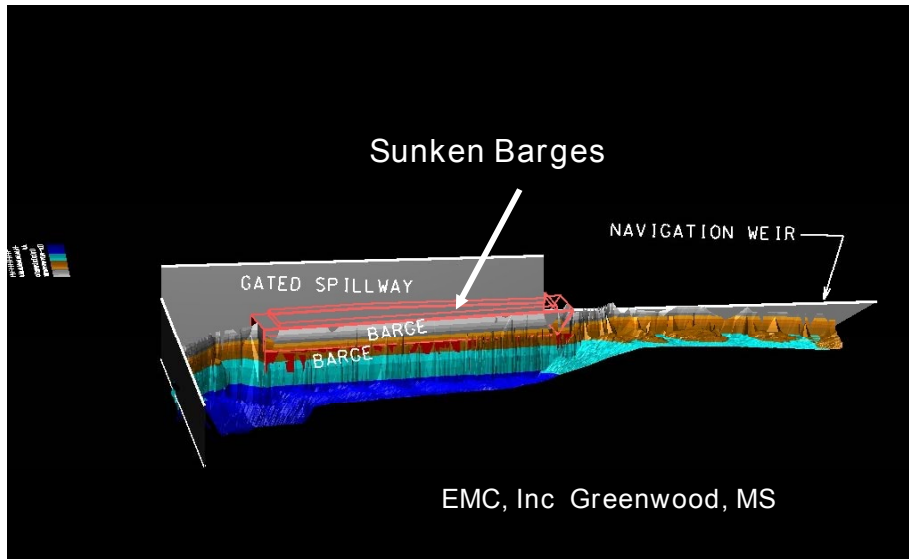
Columbia Lock & Dam (Vicksburg District)
